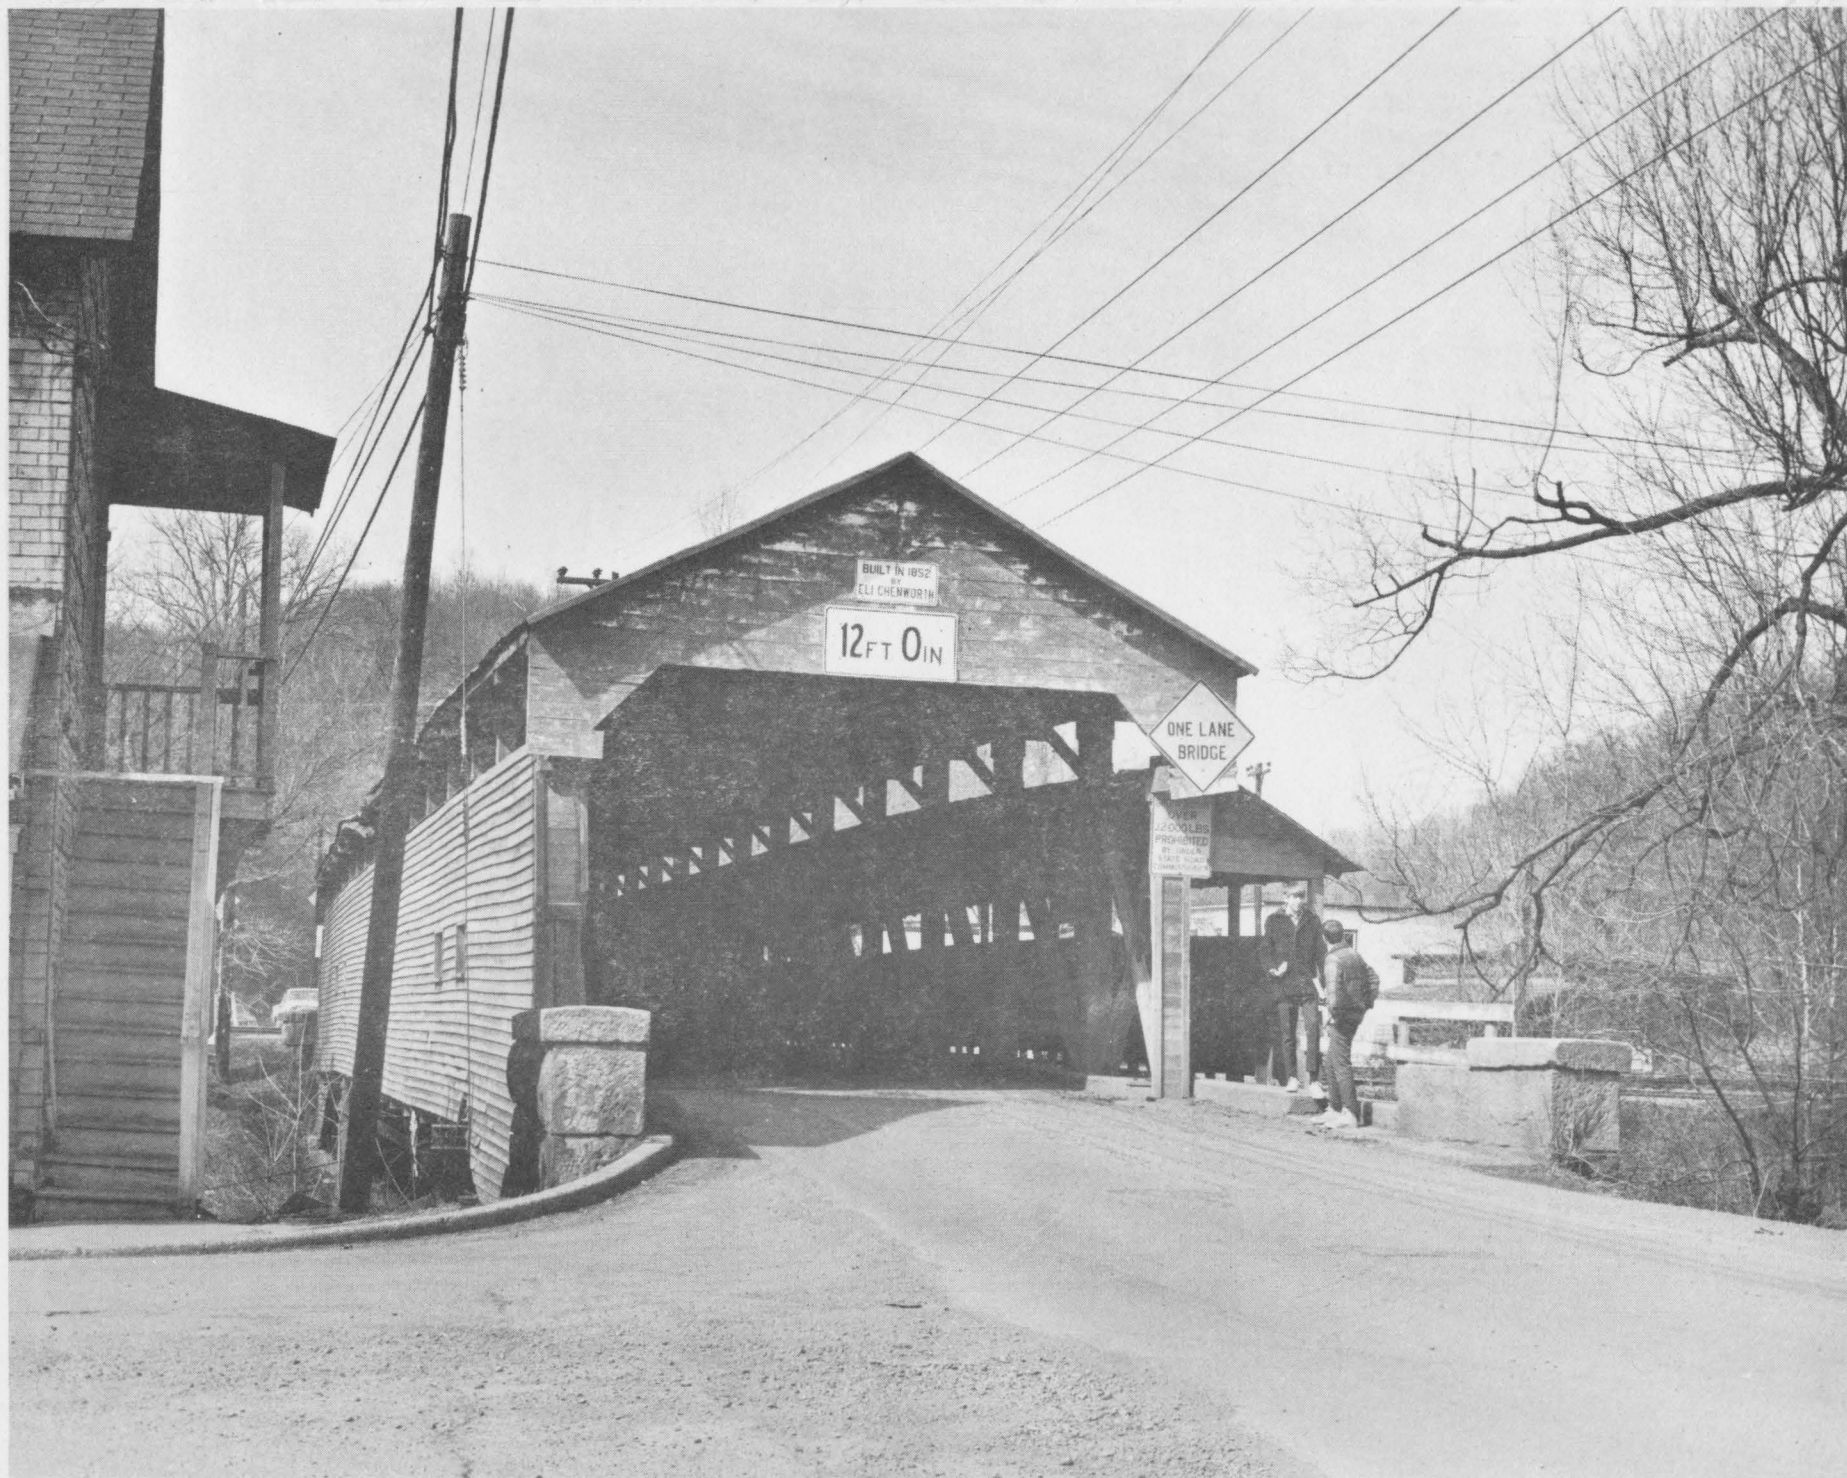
Barrackville Bridge, end elevation - William E. Barrett
